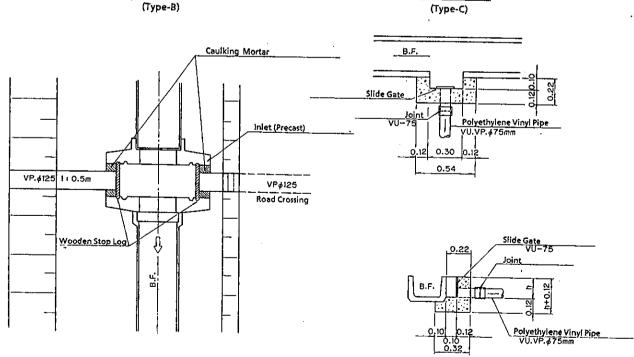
TYPICAL INLET DRAWING AT THE FUTURE STAGE
